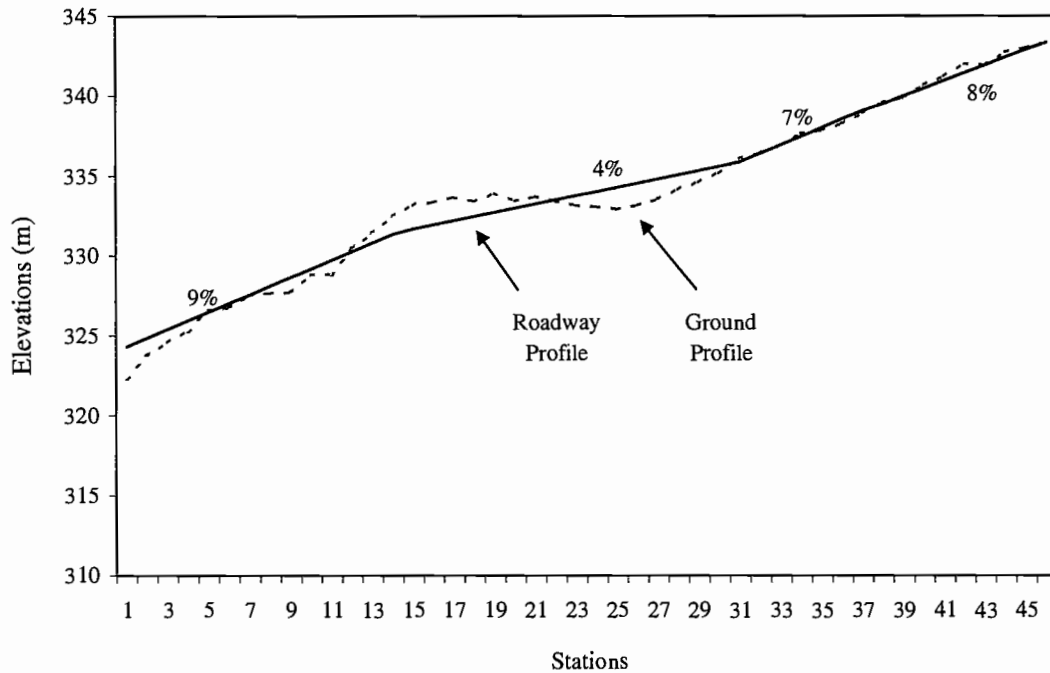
Example B: Profile view showing road gradient and vertical alignment.
